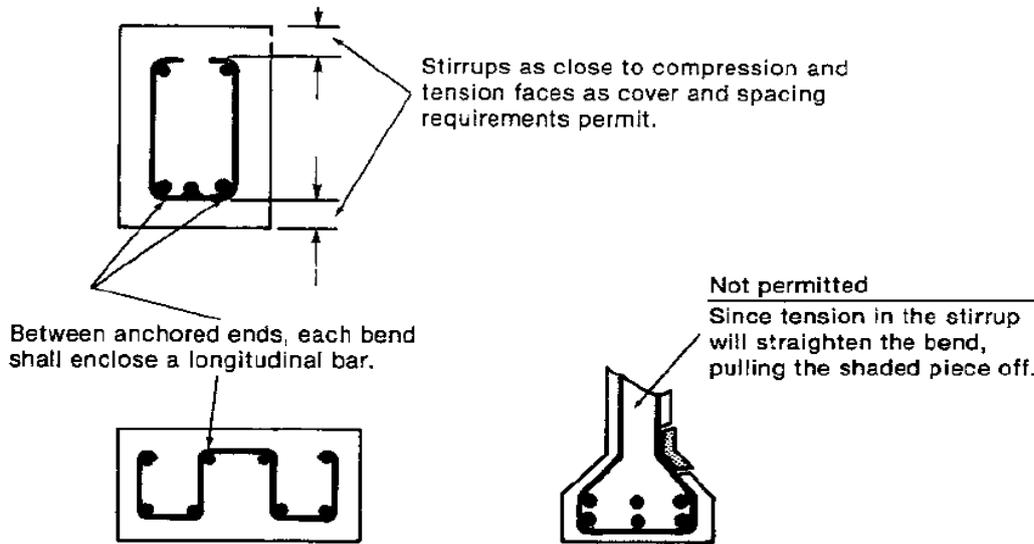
General requirements for anchorage of stirrups, continued.
